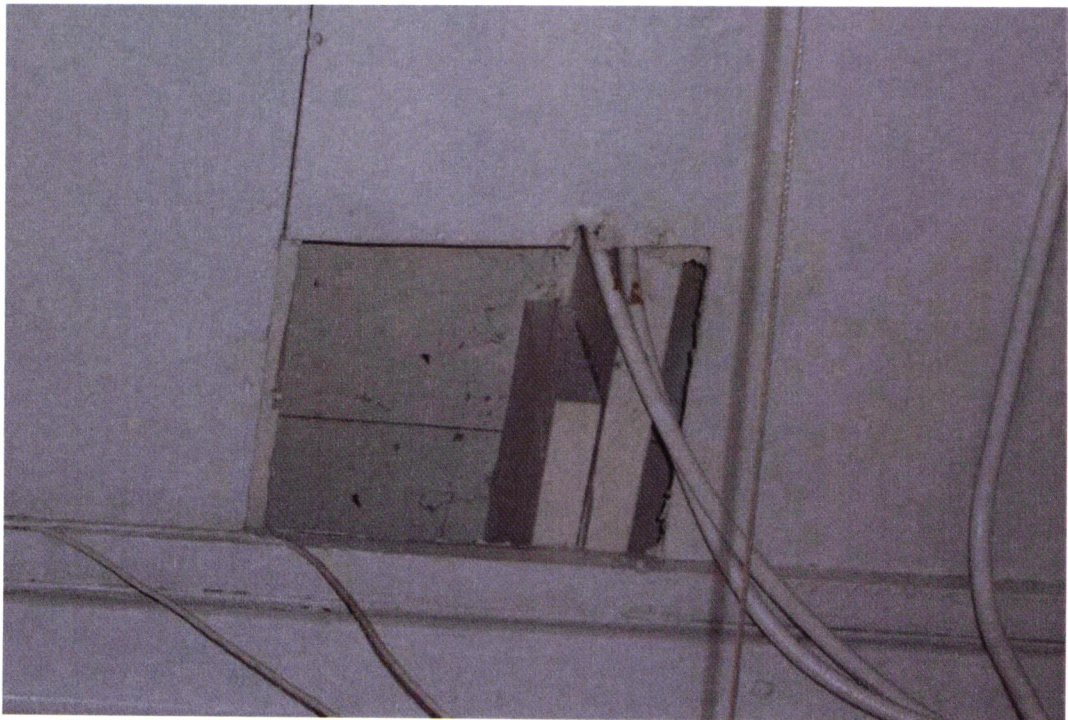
View of underside of Second Floor wood joist framing above Apparatus Room.
